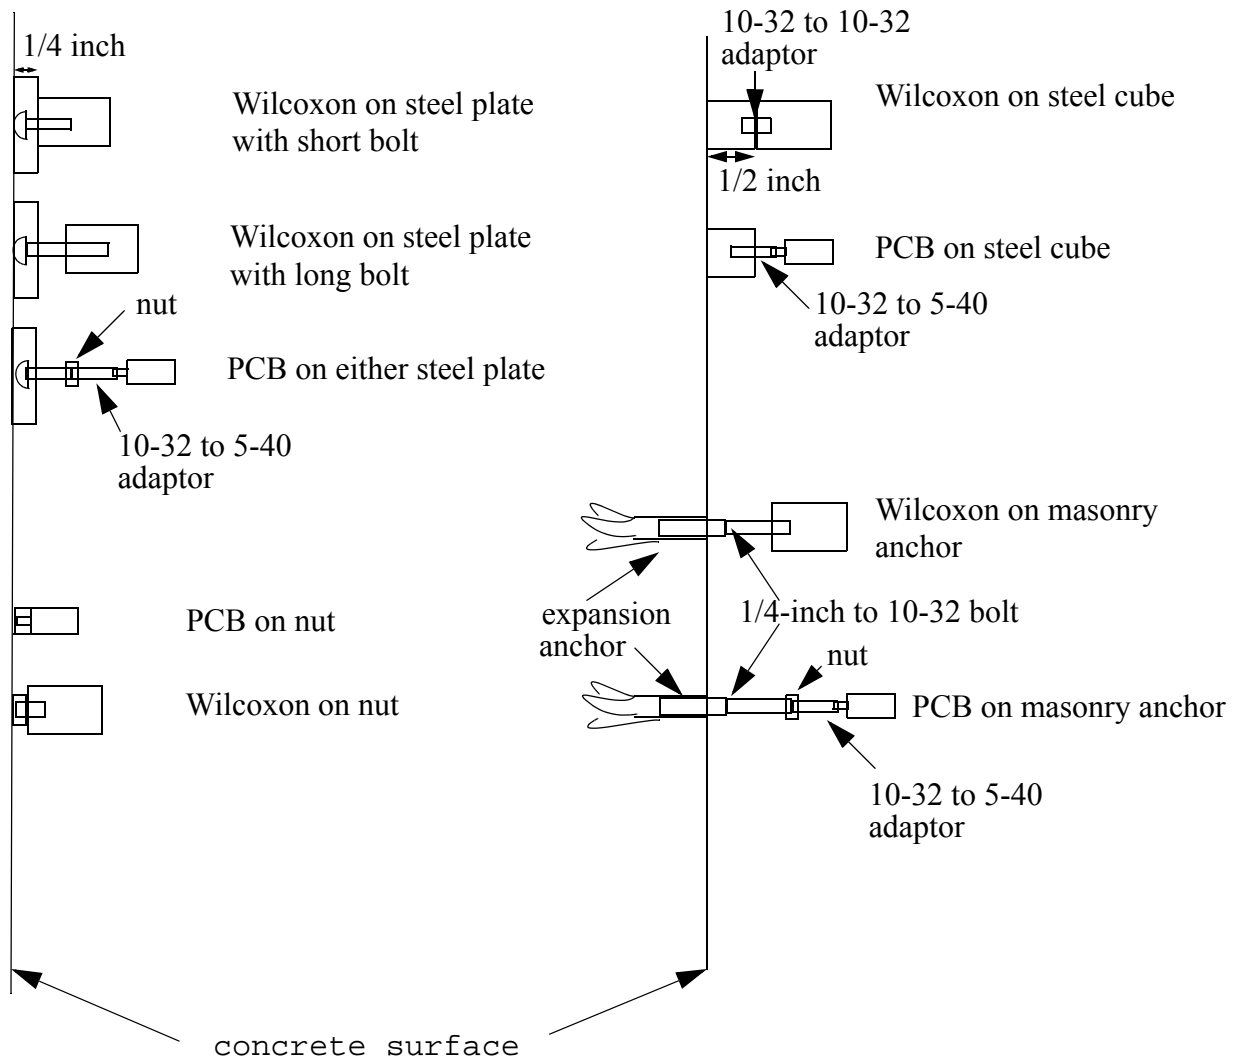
Profiles of the receiver mounting mechanisms tested with the PCB and Wilcoxon accelerometers. The numbers 10-32 and 5-40 refer to bolt thread sizes.
